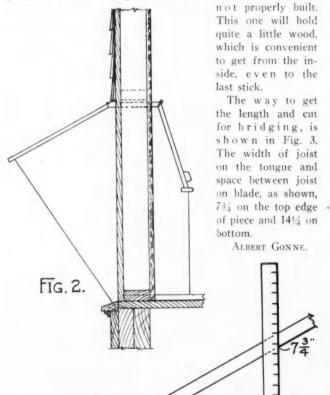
Shows Handy Wood Box Arrangement; Box is Built Into Outside Kitchen Wall.
